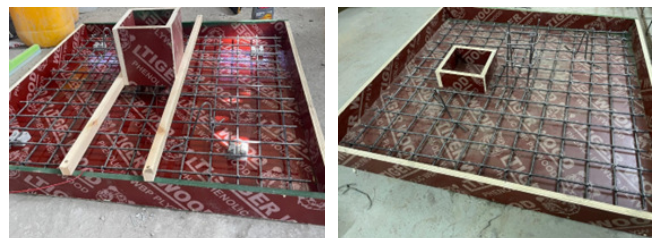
Mold and reinforcement details for a typical slab specimen.
